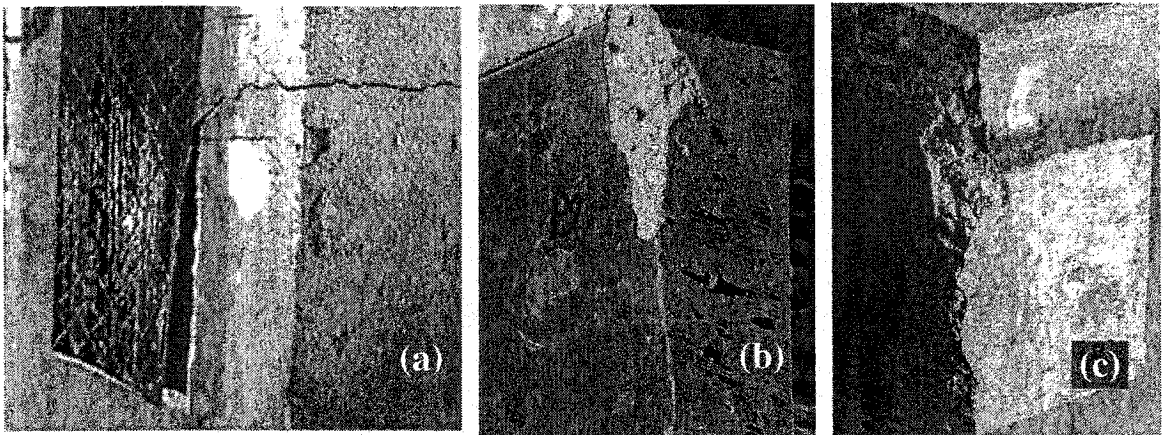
Typical failure mode for specimens P1 through P13, except for specimen P3 (a) side view (b) CFRP sheet surface (c) concrete surface
